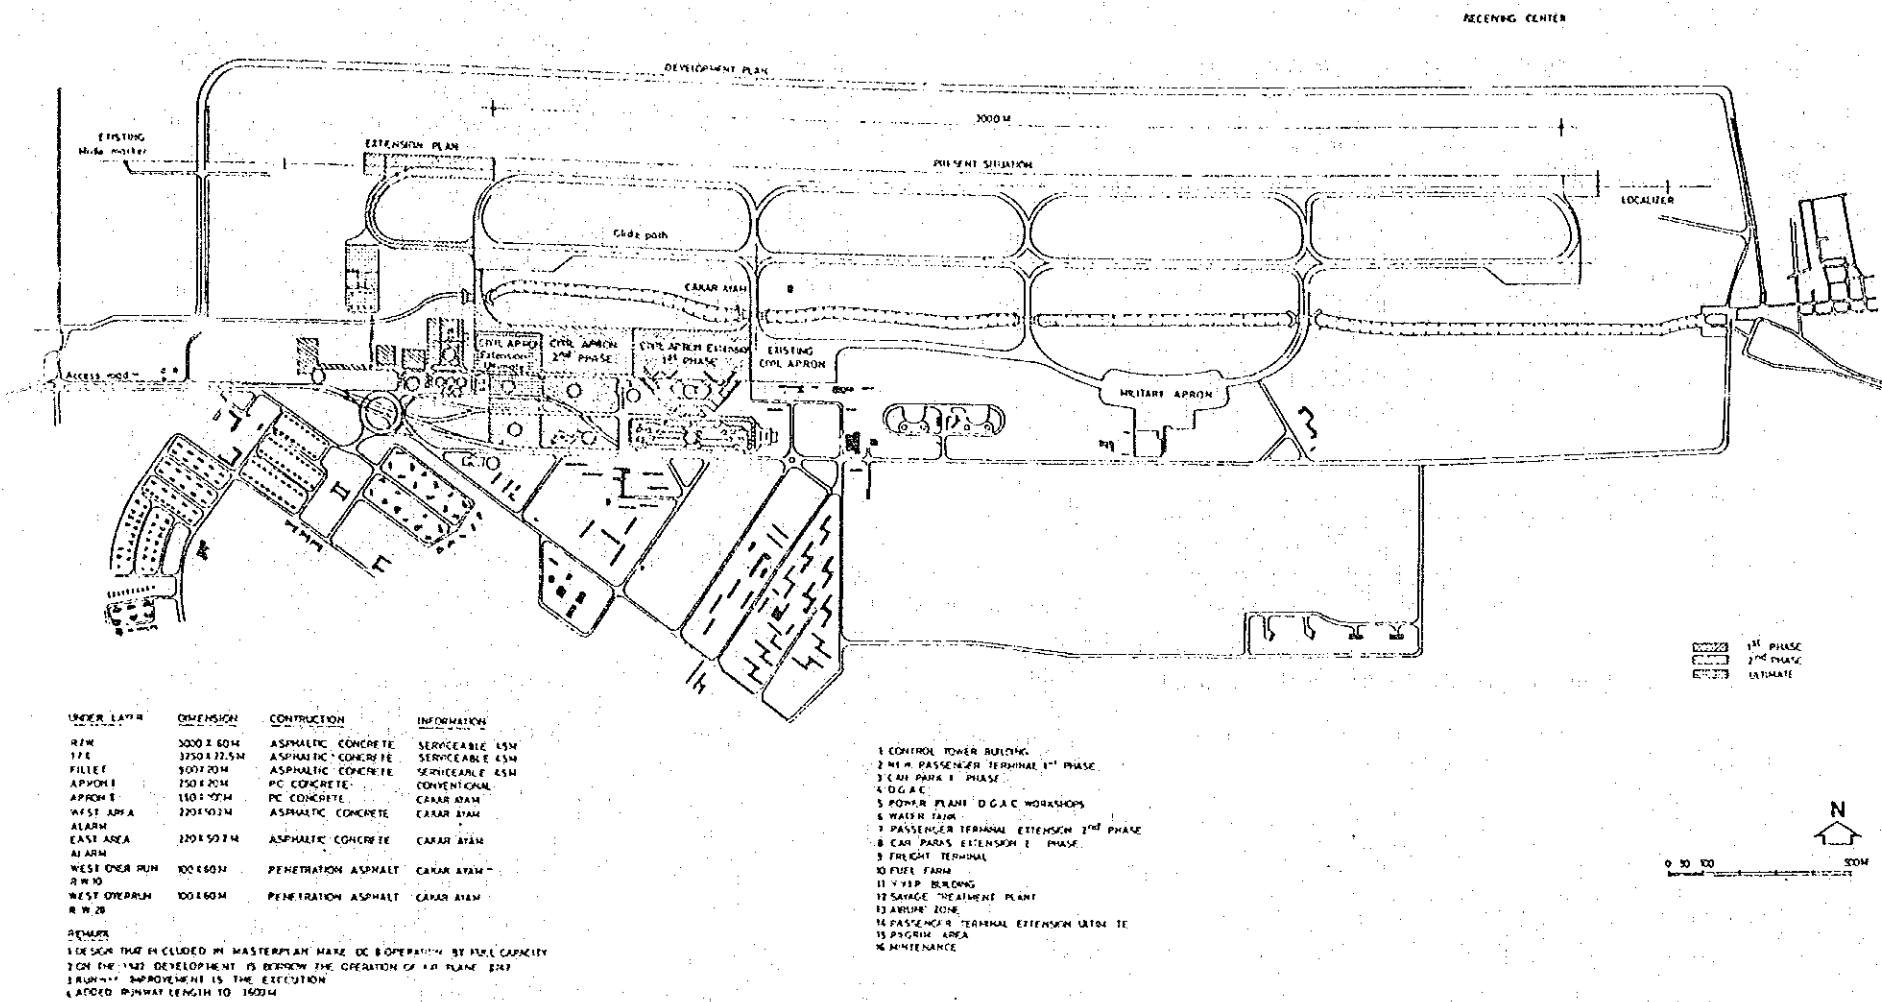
DEVELOPMENT PLAN OF JUANDA AIRPORT
